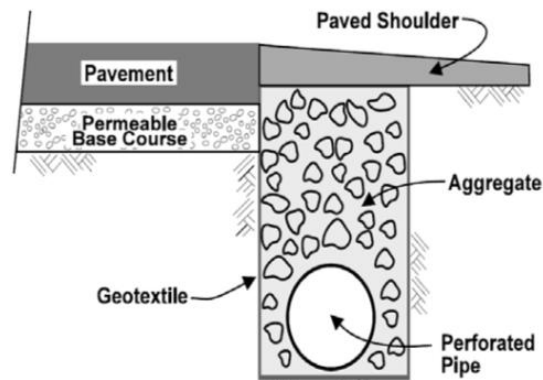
Filtration function provided by a geotextile in a pavement trench drain
